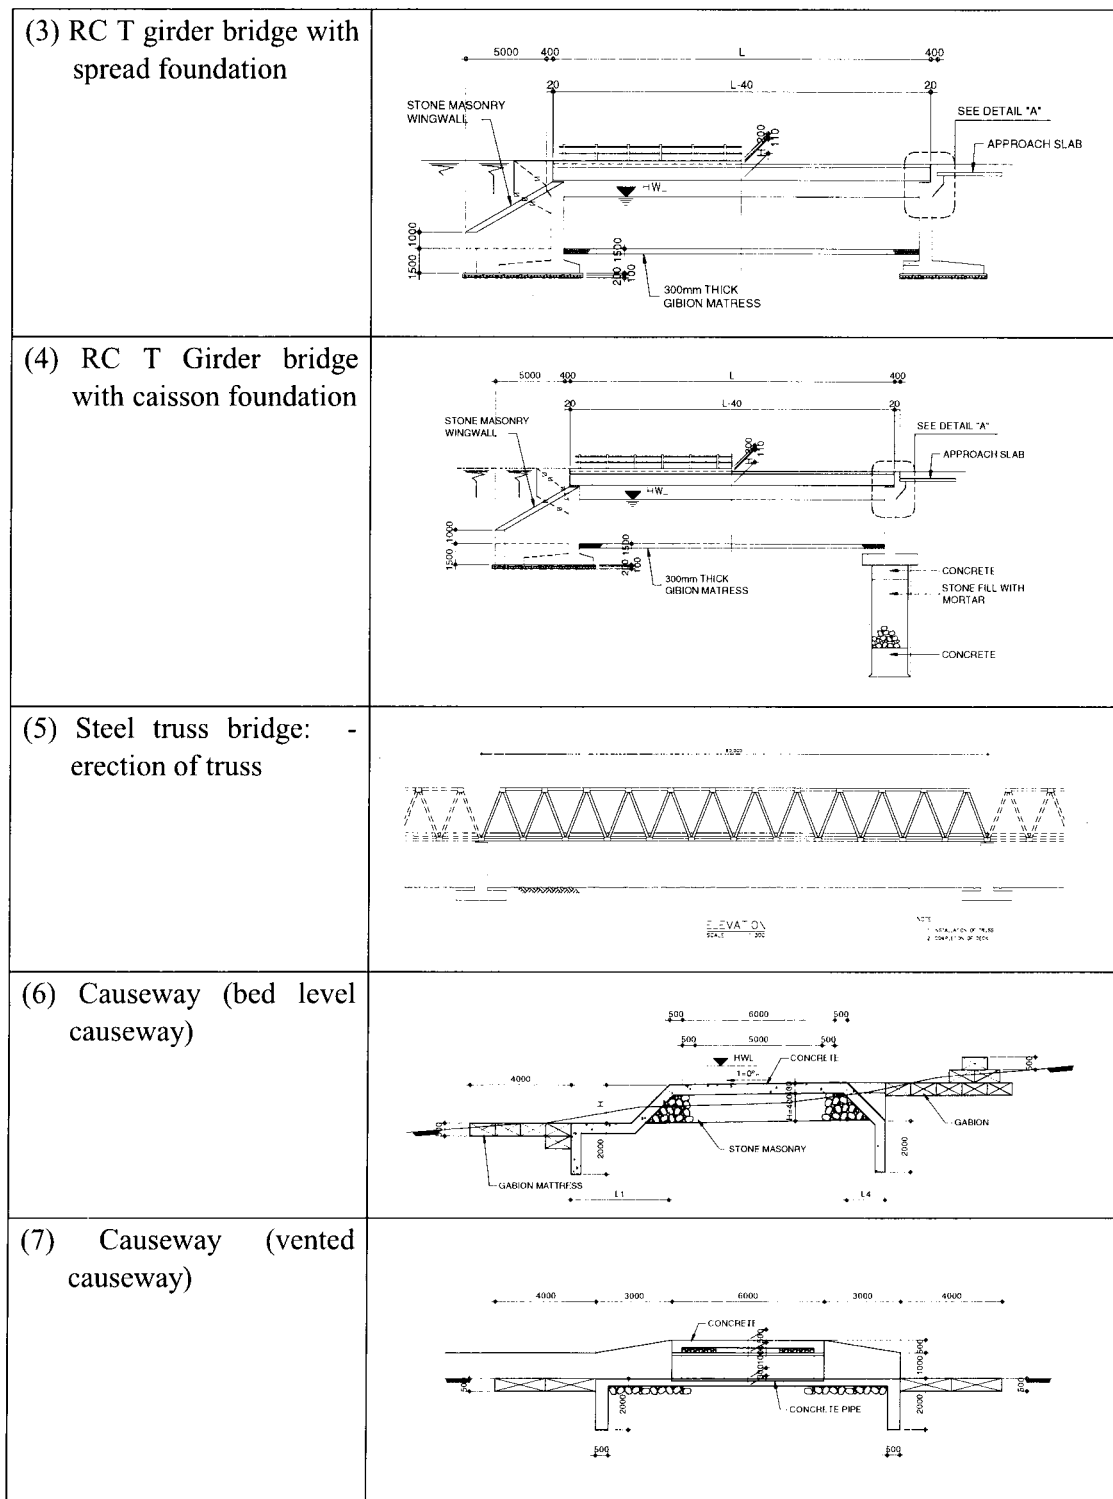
Typical Plan of Recommended Bridge Types, Causeways
